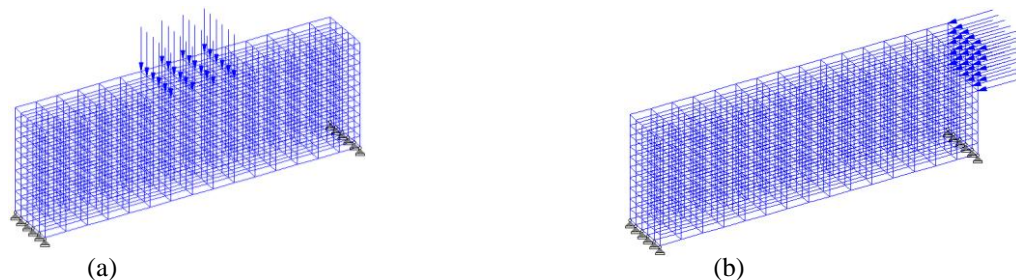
P load on the Lightweight Interlocking Brick Wall in STAAD Pro modelling, a) Load P from Above, b) Load P from Side.
